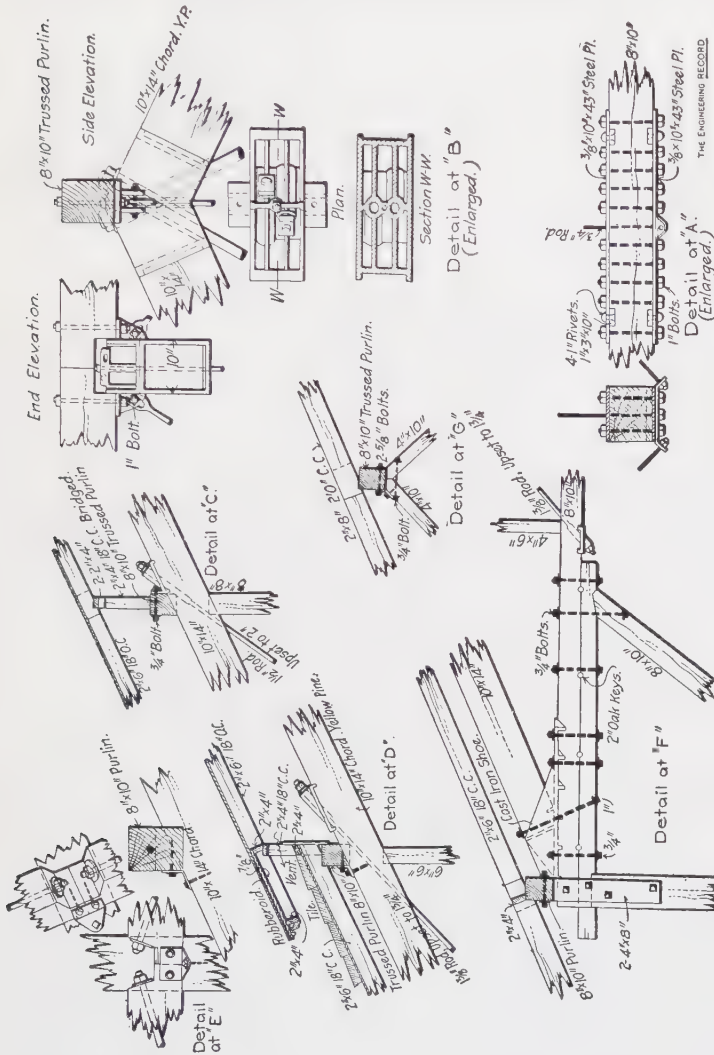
Details of Roof Truss of Forestry Building, Pan-American Exposition.
